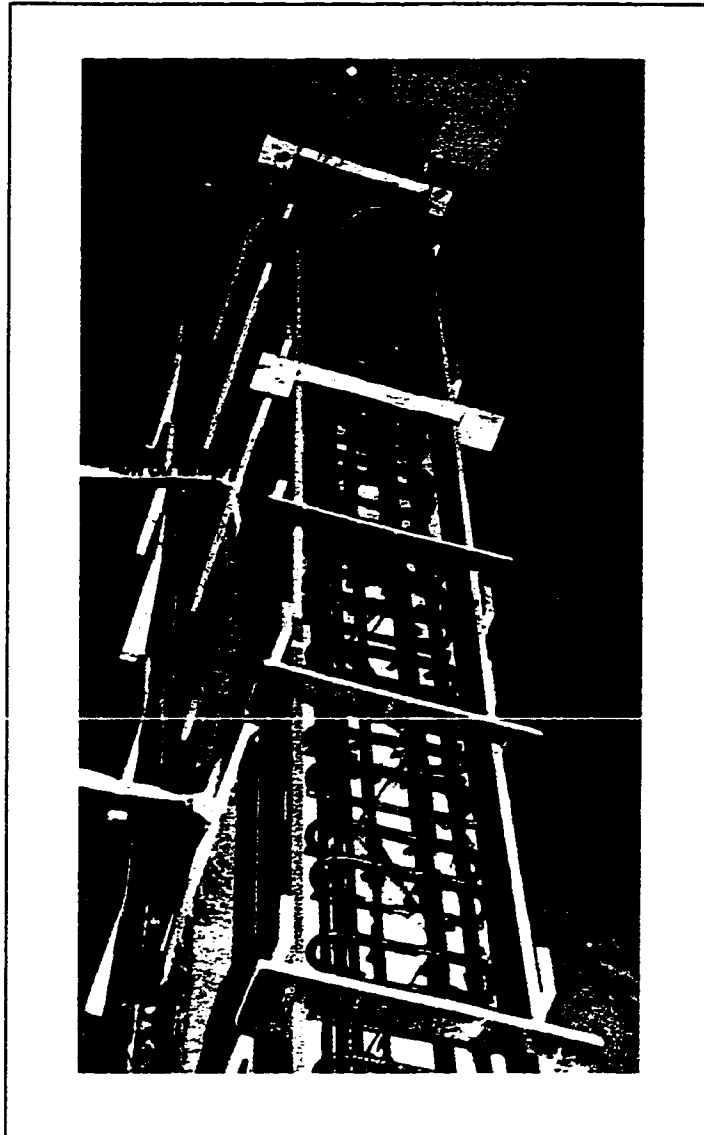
Girder A-285 ready for casting the top flange and the end blocks
